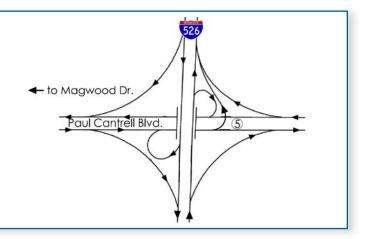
I-526 at Paul Cantrell Boulevard Alternative 1
